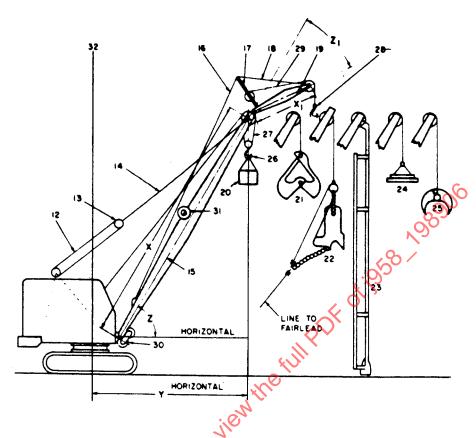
COMMON CRANE BOOM EQUIPMENT
